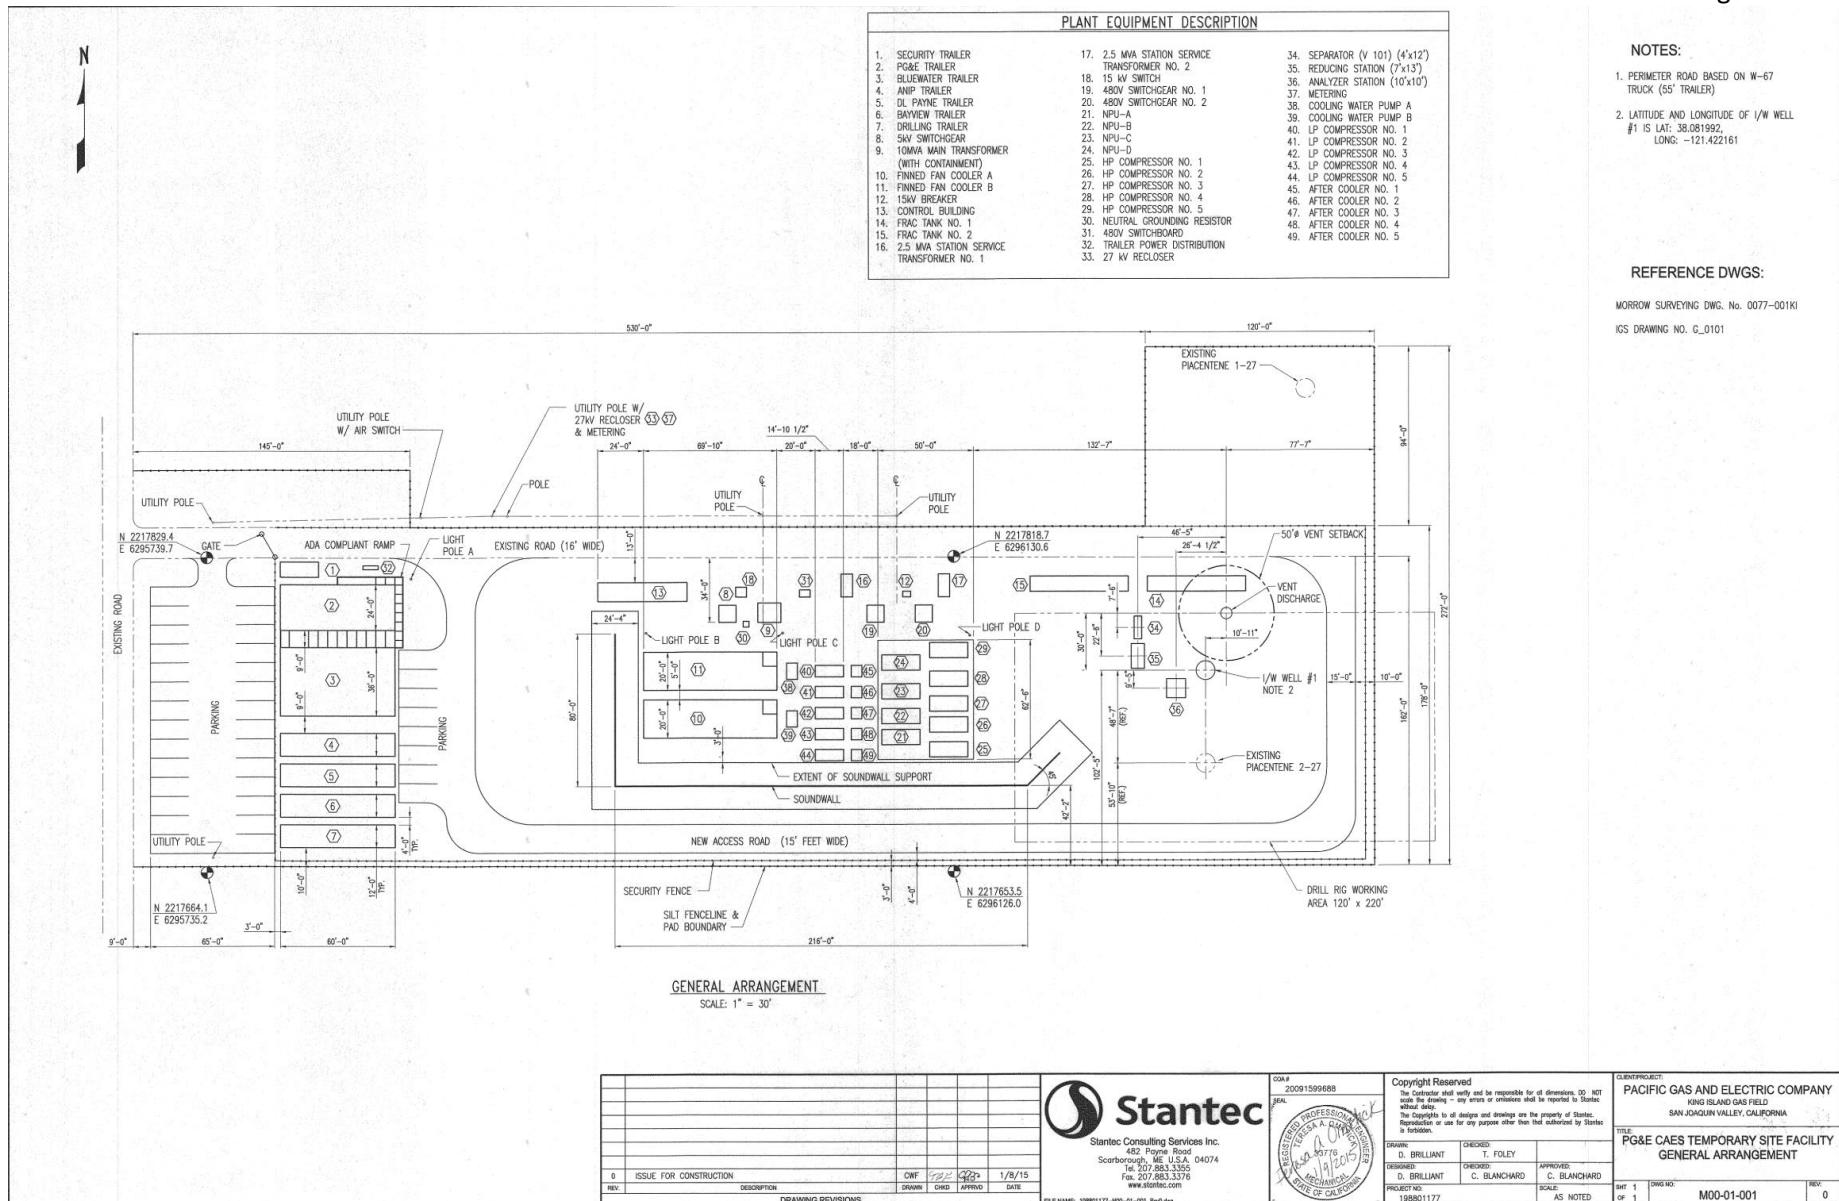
General Arrangement of Equipment for the Temporary Site Facility (TSF)
